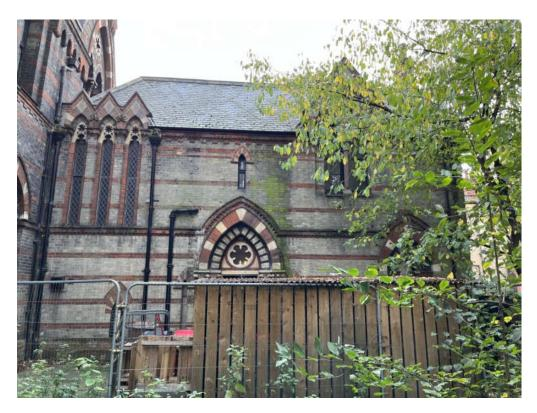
Metal restraint brackets present on West wall mimicking brackets on West elevation of St Andrew's Hall
